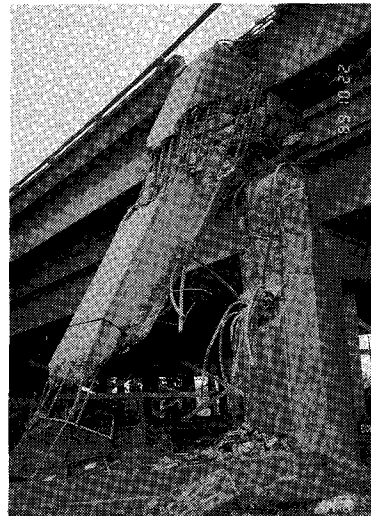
Collapse of the Cypress Double-Deck Bridge on the opposite side of Photo.1
